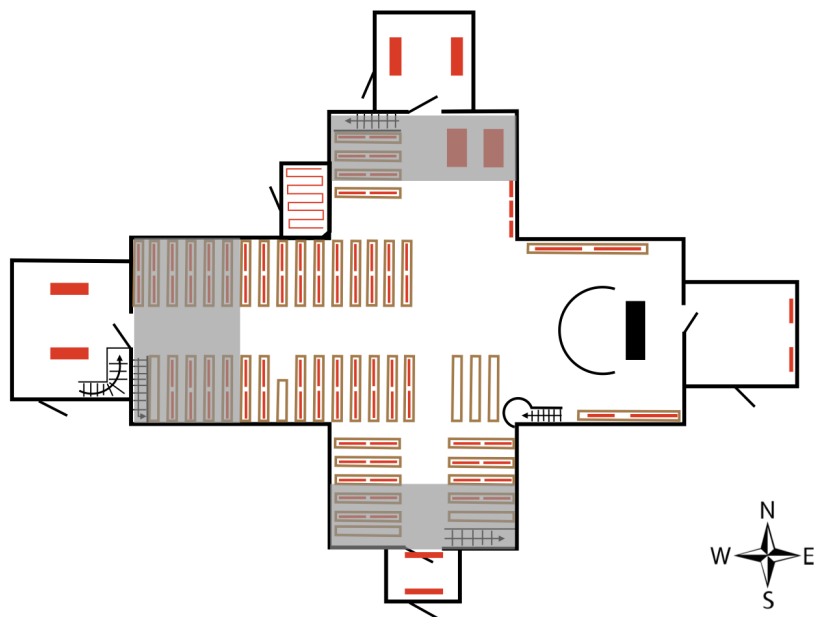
Landvik Church Floorplan and Heat Source Placement
